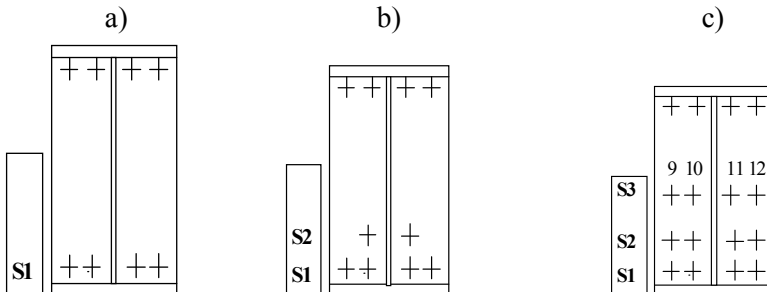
Chosen examples of M20-10.9 bolts location in tested connections
